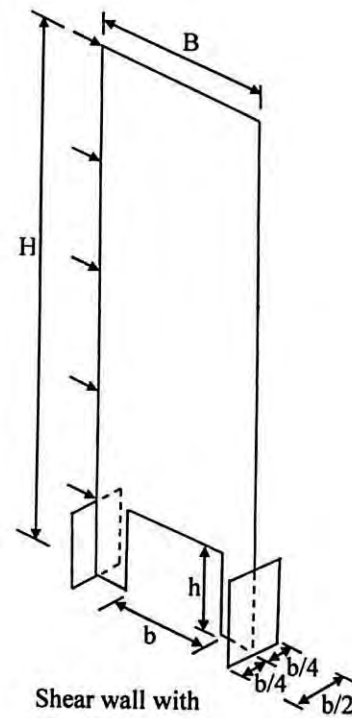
Shear Wall with Compensatory Element (2nd Alternative).
